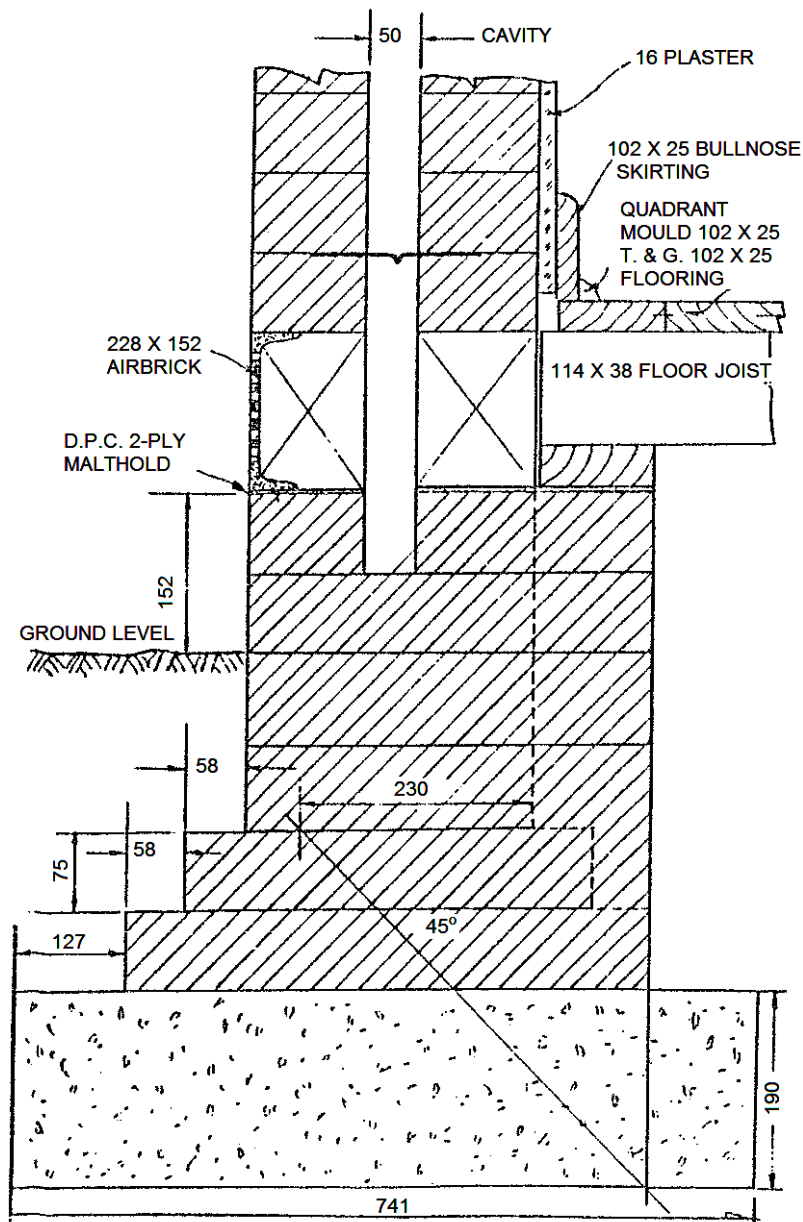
Section through 280 mm cavity wall showing method of obtaining foundation and footing courses
